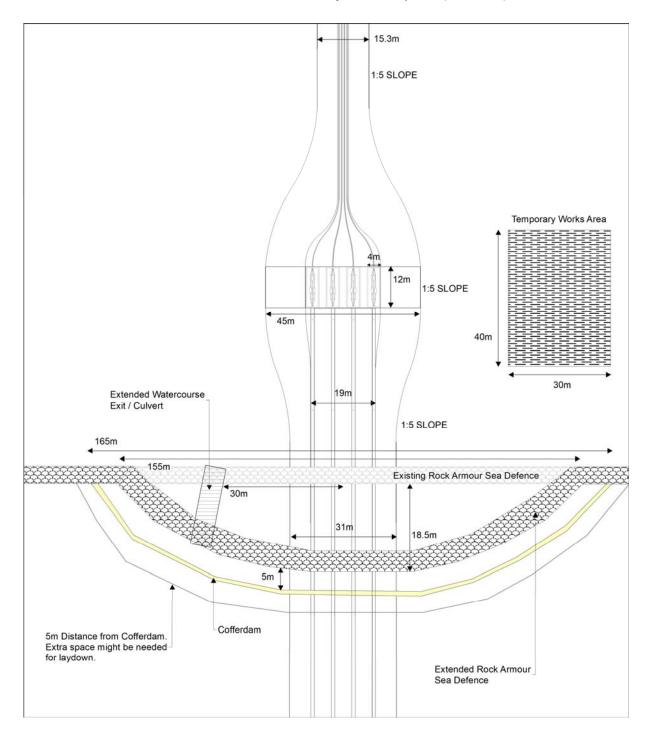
Indicative Option 2 landfall layout (plan view).
